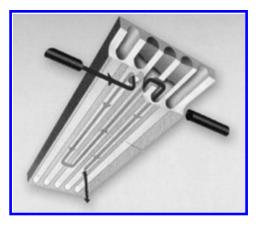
Typical insulated precast concrete floor system. (From http://www.sustain ableprecast.ca/thermal_mass/precast_sustainability/canada/index.do.)
